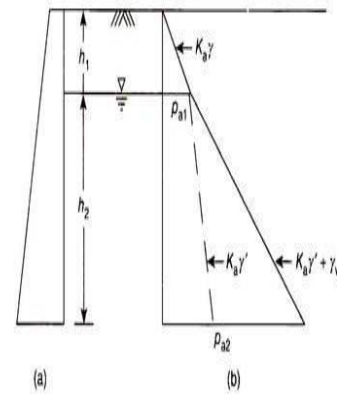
(a) Retaining wall with partially submerged backfill and (b) active earth pressure diagram.
